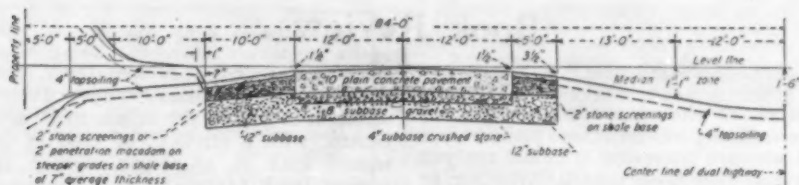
Cross Section through Road with Expansion Joints Two Miles Apart.
